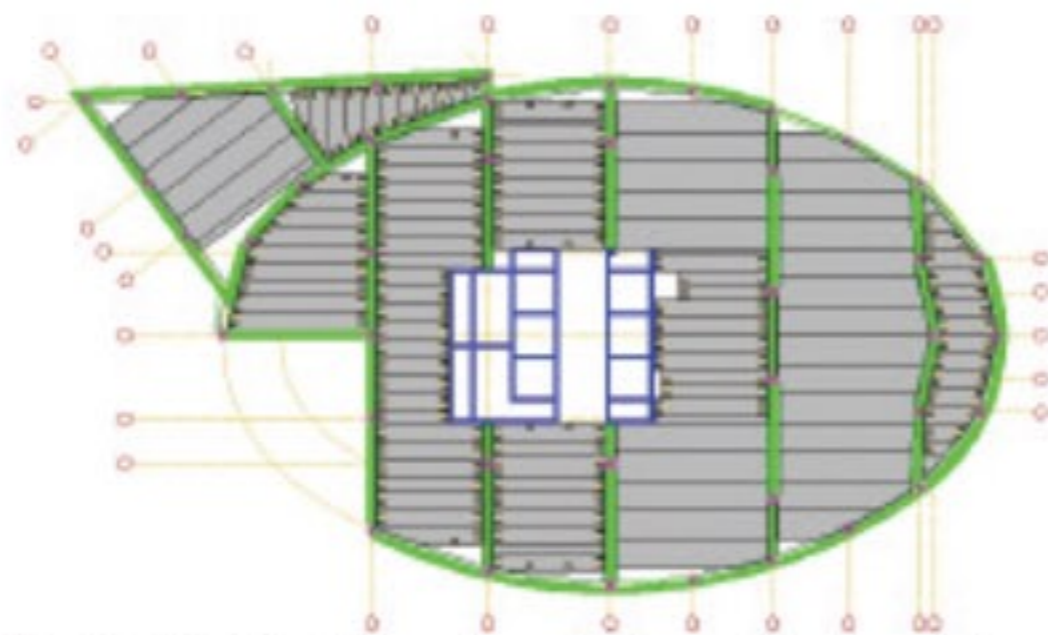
Flexibility in design and construction enables this oval shape building in Brussels, Belgium, to be prefabricated with mainly rectangular concrete elements
